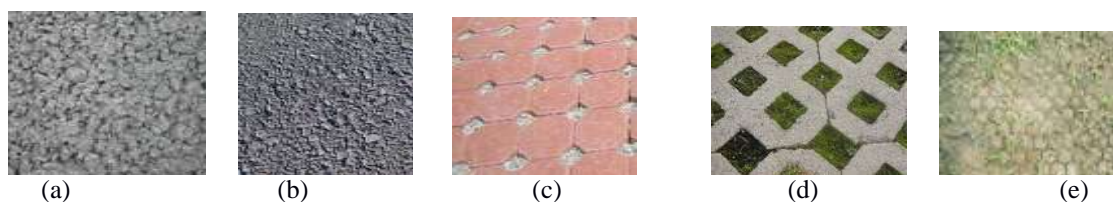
(a) Permeable Concrete. (b) Permeable Asphalt. (c) Permeable interlocking concrete pavers with pea gravel fill. (d) Concrete grid pavers with topsoil and grass fill. (e) Plastic reinforcement grid pavers with earth and grass fill.
